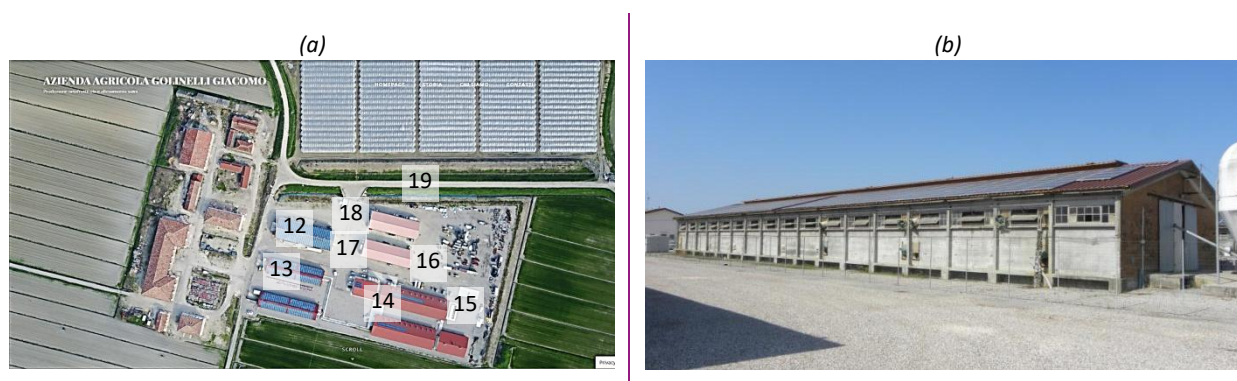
(a) General layout plan of the farm and (b) GOLINELLI farm building 12 (outside view).
